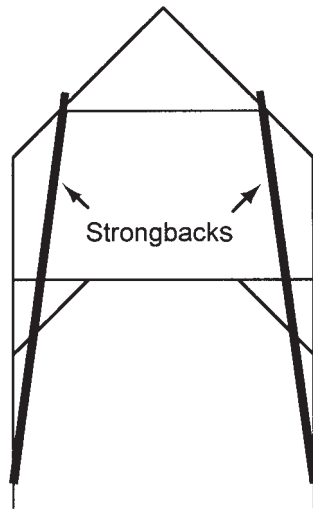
STRONGBACKS FITTED TO ASSEMBLY TO PREVENT UNWANTED HINGING.
